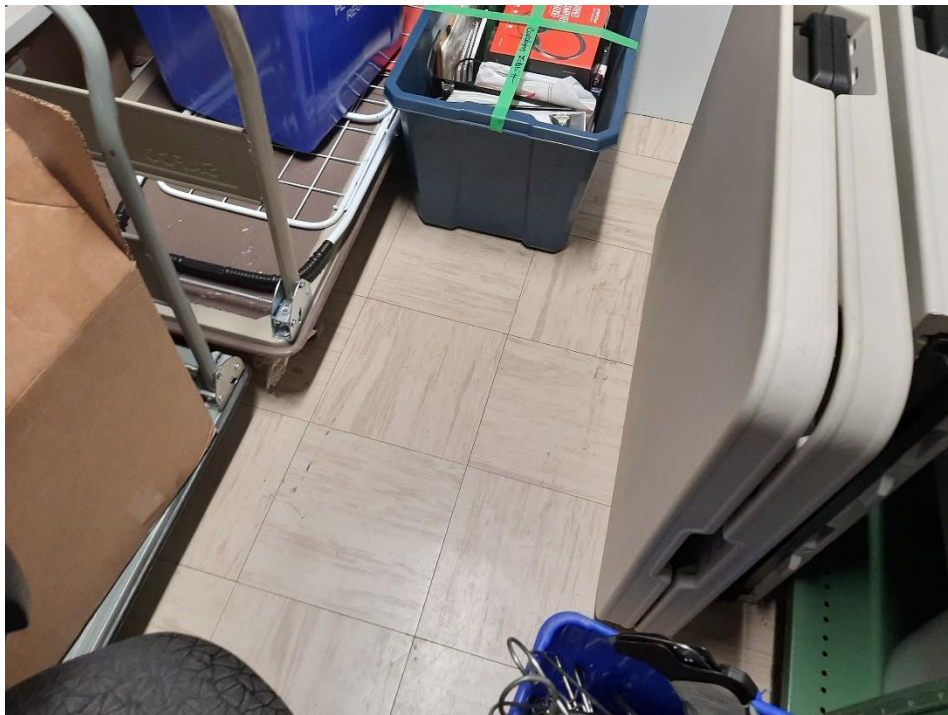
Asbestos-containing vinyl floor tiles present in the Level 2 vault.
